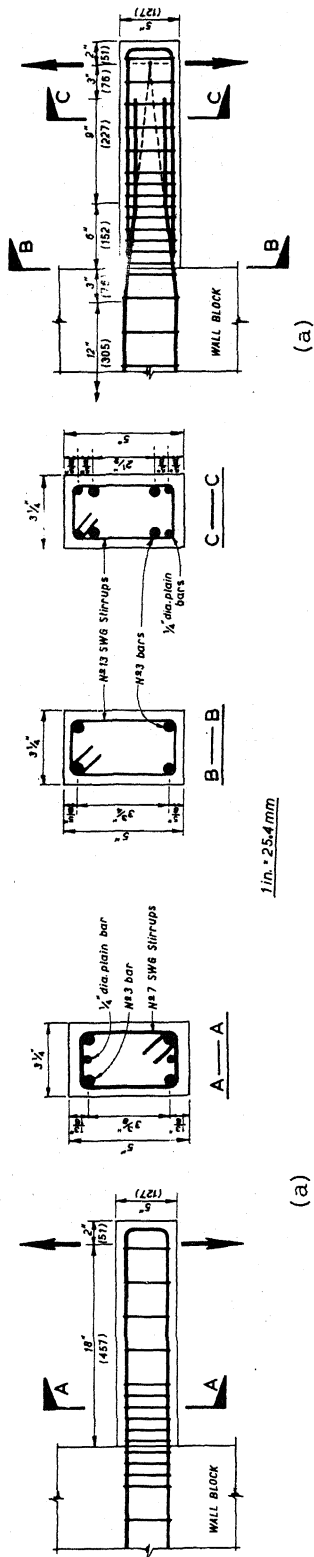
Details of a Conventionally Reinforced Beam-Wall Junction Specimen.
